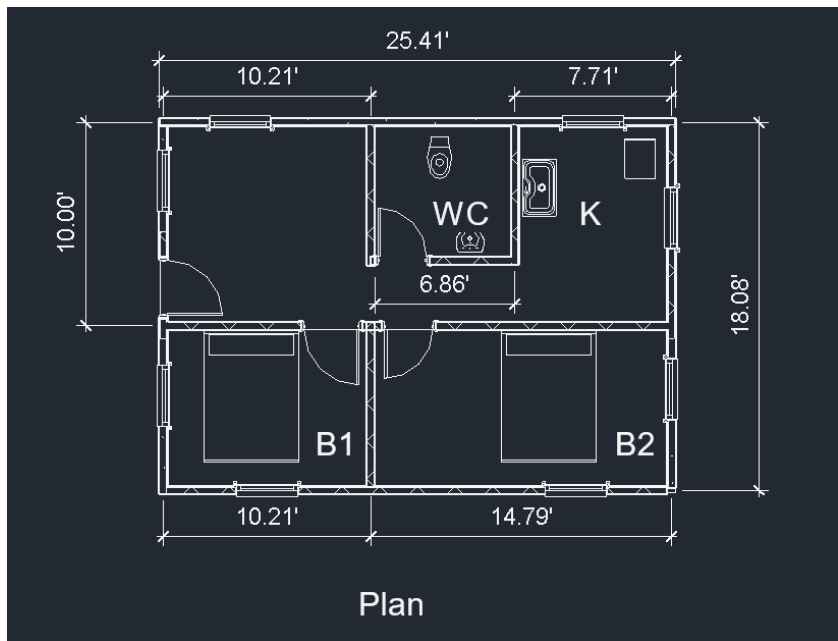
4 PLAN OF RAPID ASSEMBLED HOUSE
